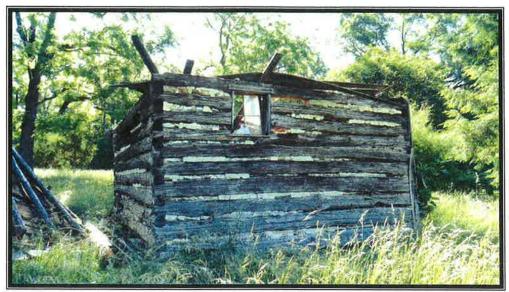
View of school, side (north) and rear (west) elevation, looking east.
